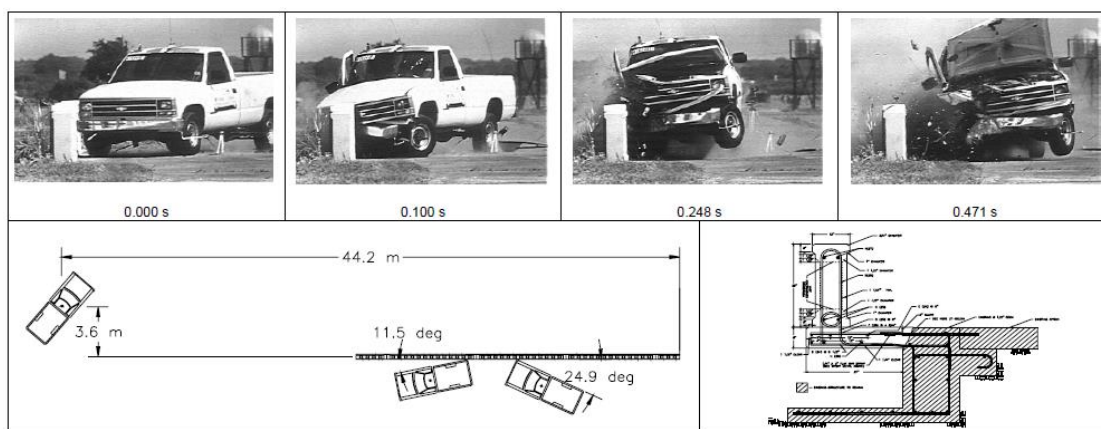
Failed pickup truck test of the Texas T411 bridge rail (Buth et. al, 1998)
